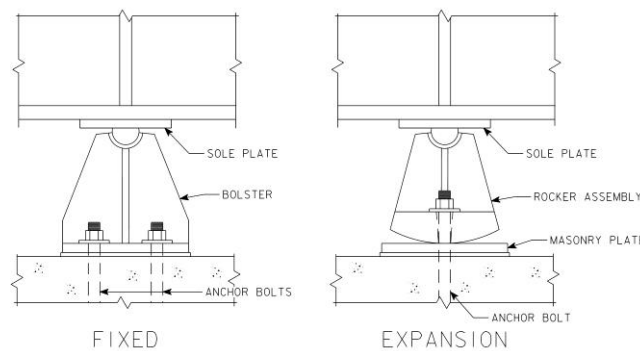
Fabricated Rocker Bearing or Bolster
